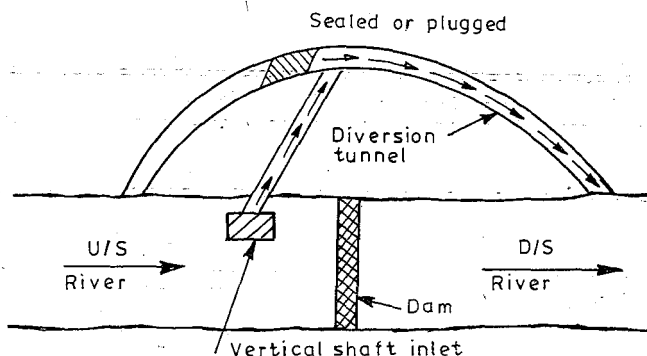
Diversion Tunnel being used as a conduit for the shaft spillway.
